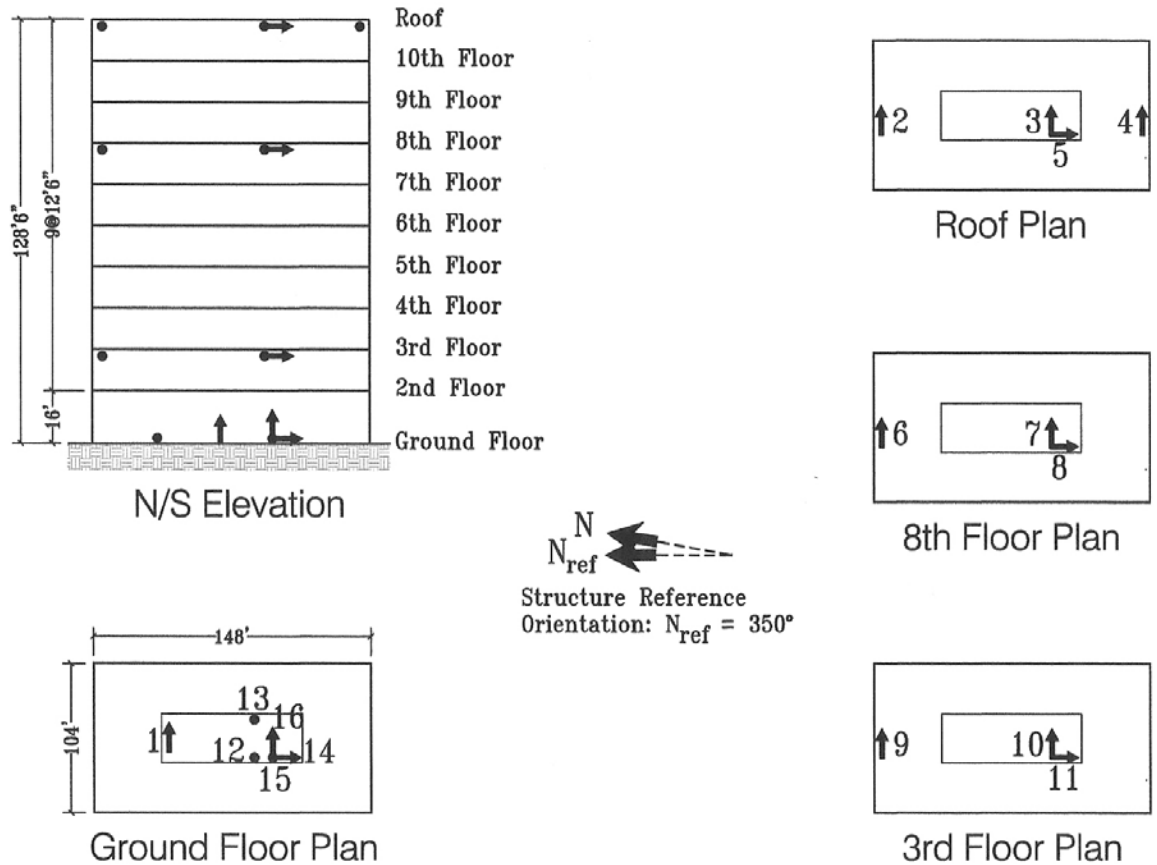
CSMIP Station No. 58364: Walnut Creek 10-Story commercial building, sensor location sketch.
